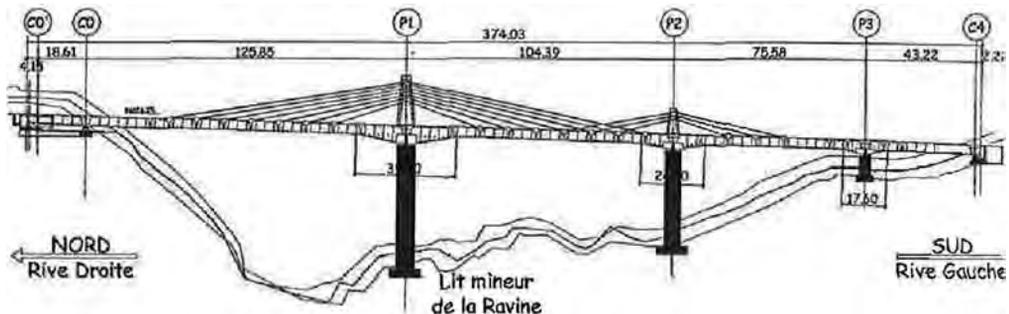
Ravine des Trois Bassins Bridge<sup>38</sup>
